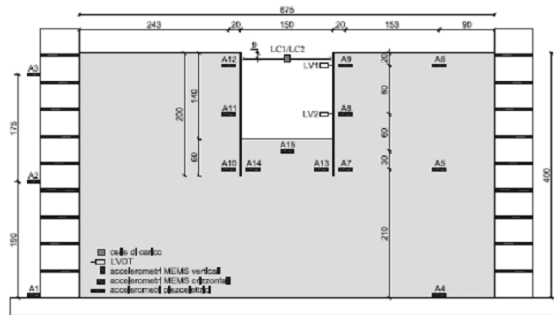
Layout of dry test PW2 (Conti, 2010).
